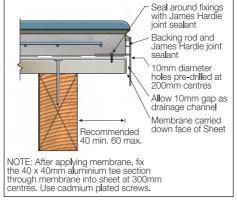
METHOD 2 - DECK EDGE DETAIL USING ALUMINIUM TEE SECTION
